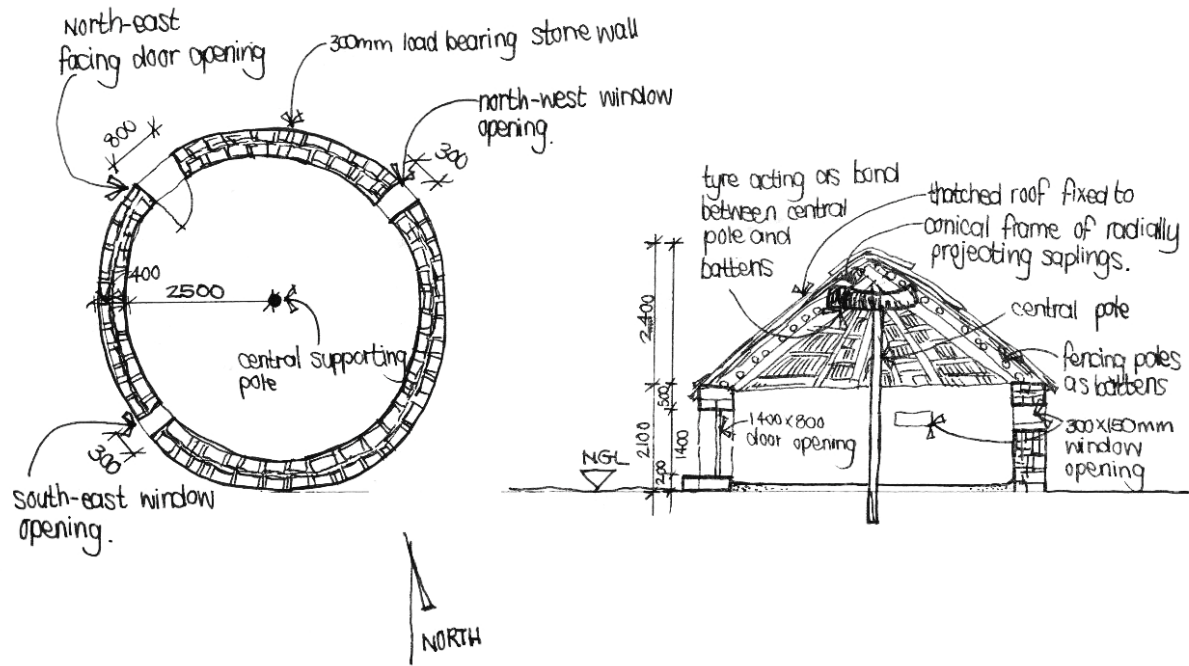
Illustration of the plan and section showing the structural detailing of the rondavel
